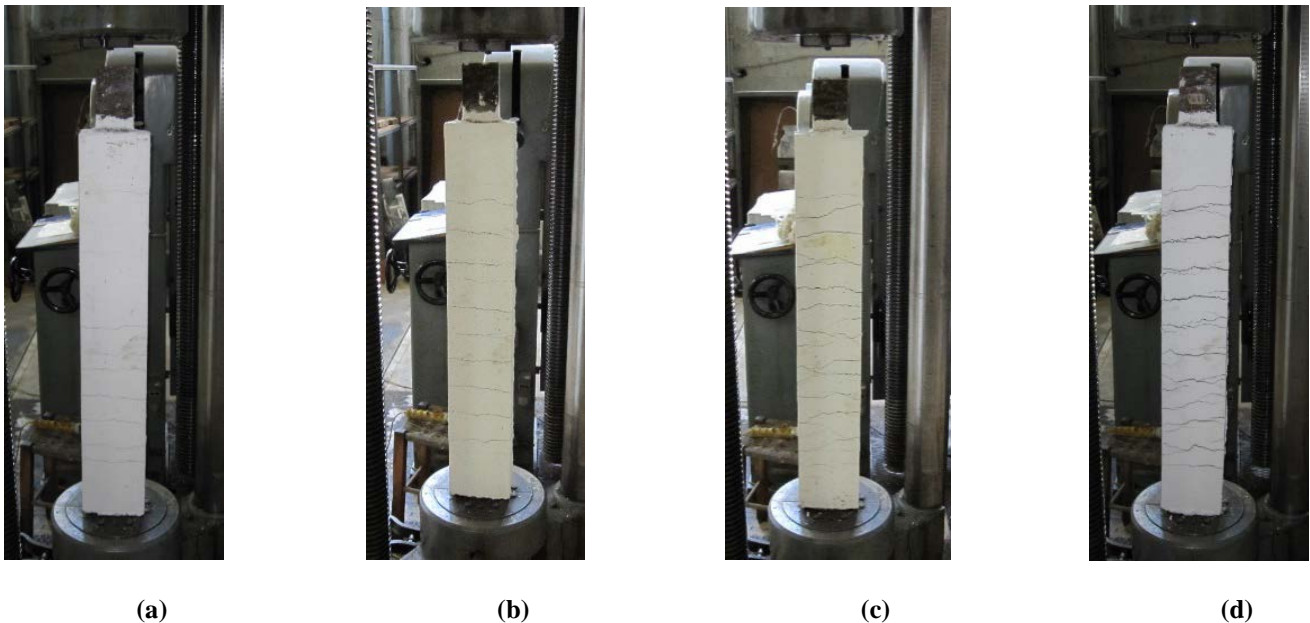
Specimens after the uniaxial tensile test: (a) CH-10, (b) CH-20, (c) CH-30, (d) CH-50.
